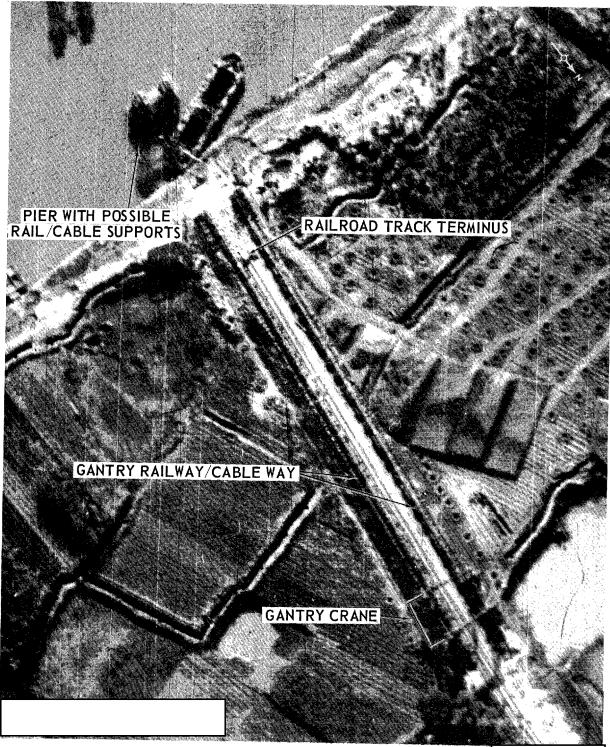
RAILROAD BRIDGE UNDER CONSTRUCTION, HA NOI/PING-HSIANG RAIL LINE, NORTH VIETNAM
